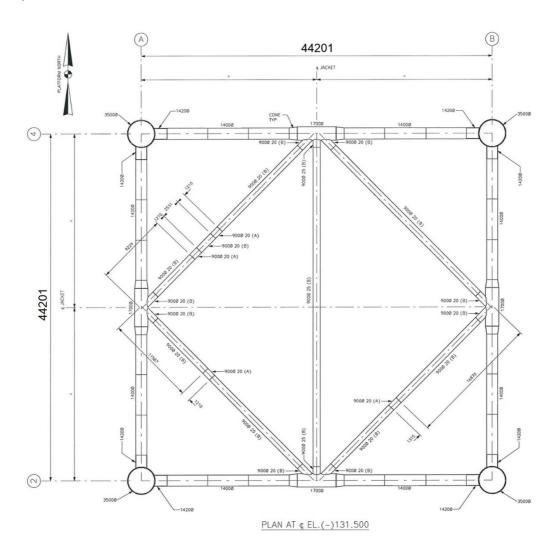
Solan jacket bracing plan at EL. -131.500
